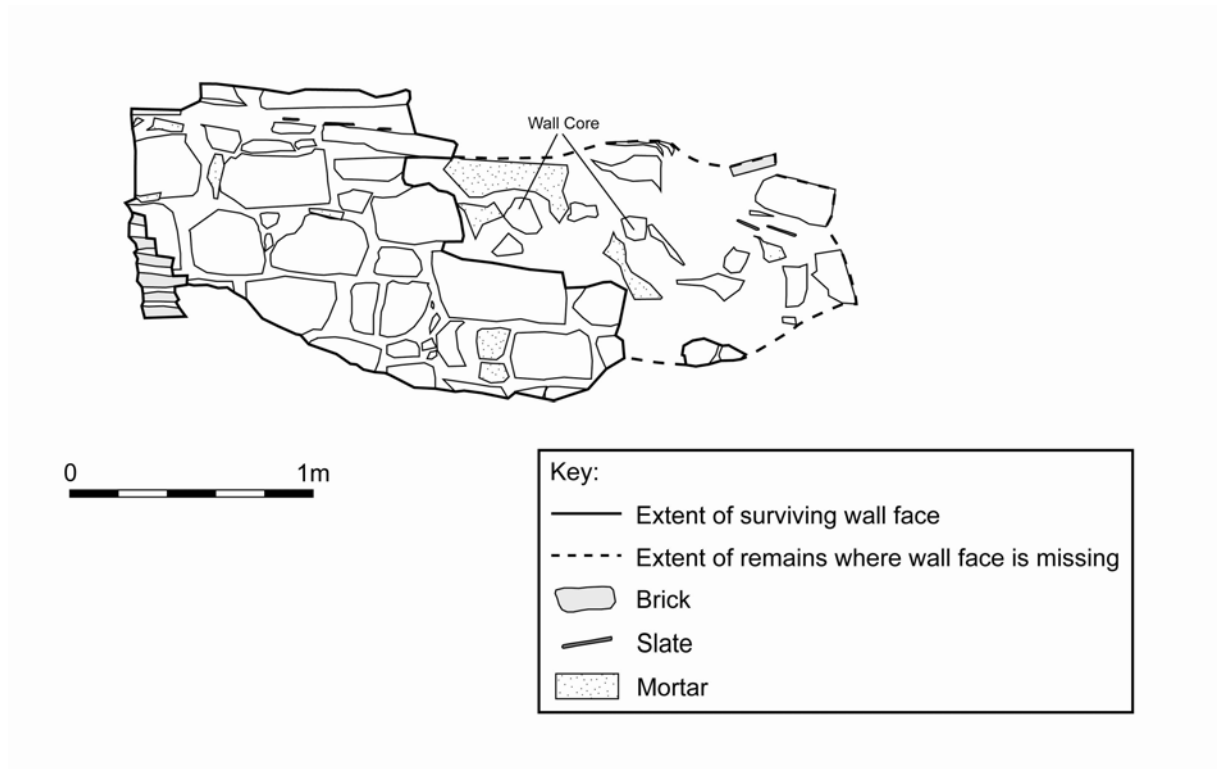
Structure 1, West Stair: Elevation b (South-facing revetment)
